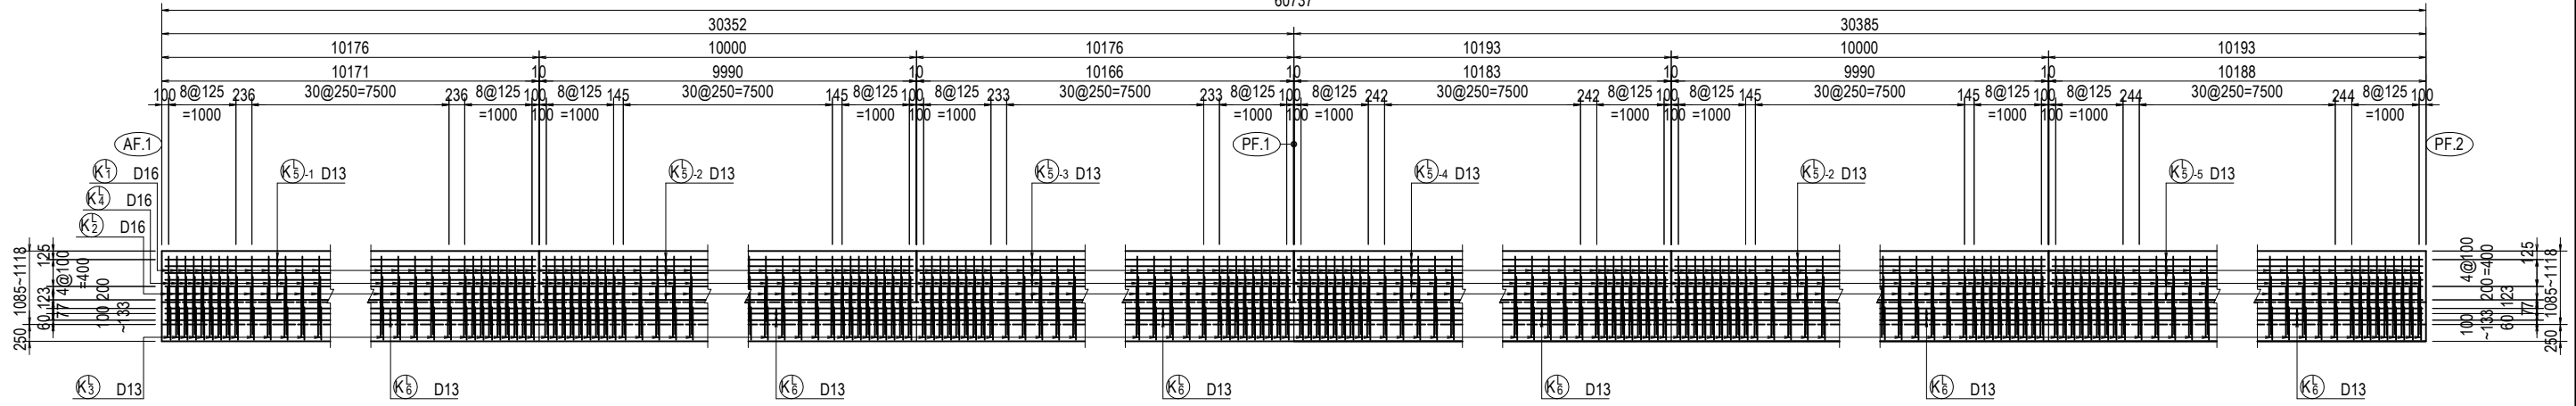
# DETAIL OF CONCRETE CURB, BARRIER AND MEDIUM (AF1-PF2) (1)
